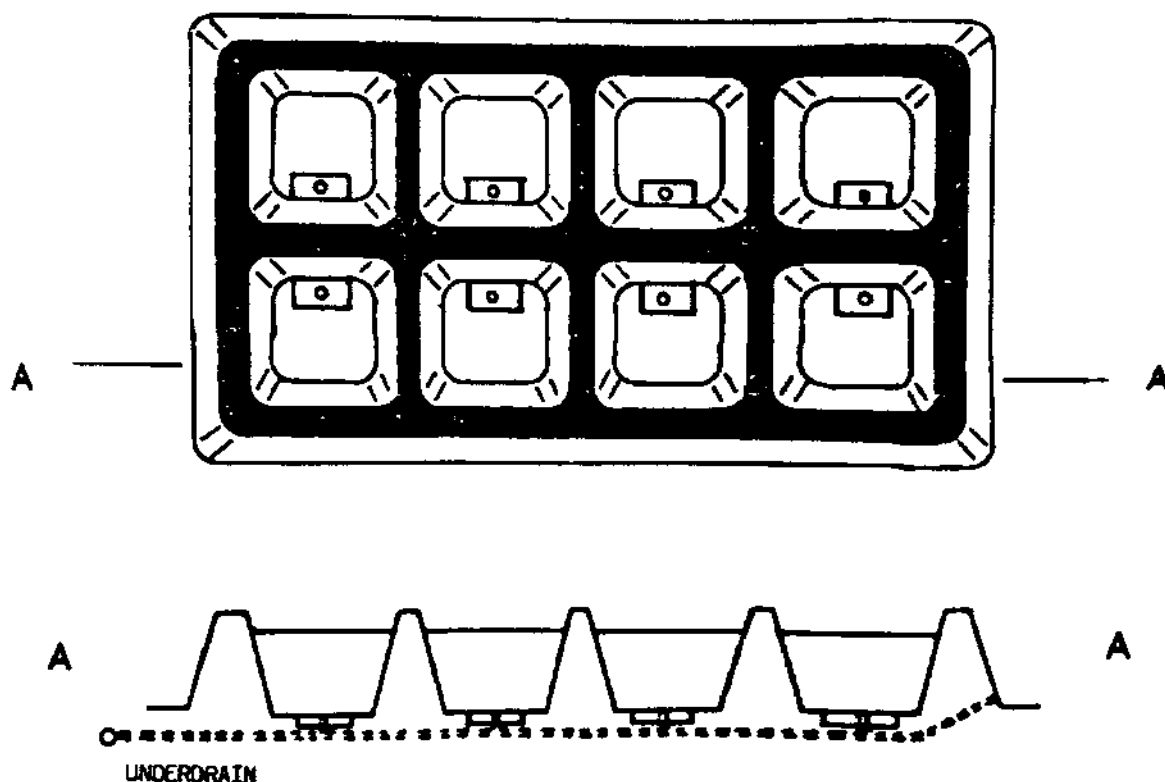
Layout for earthen pond option for Hawaii used in "Economic Analysis" section of this report. A plan view and a side view are shown.
